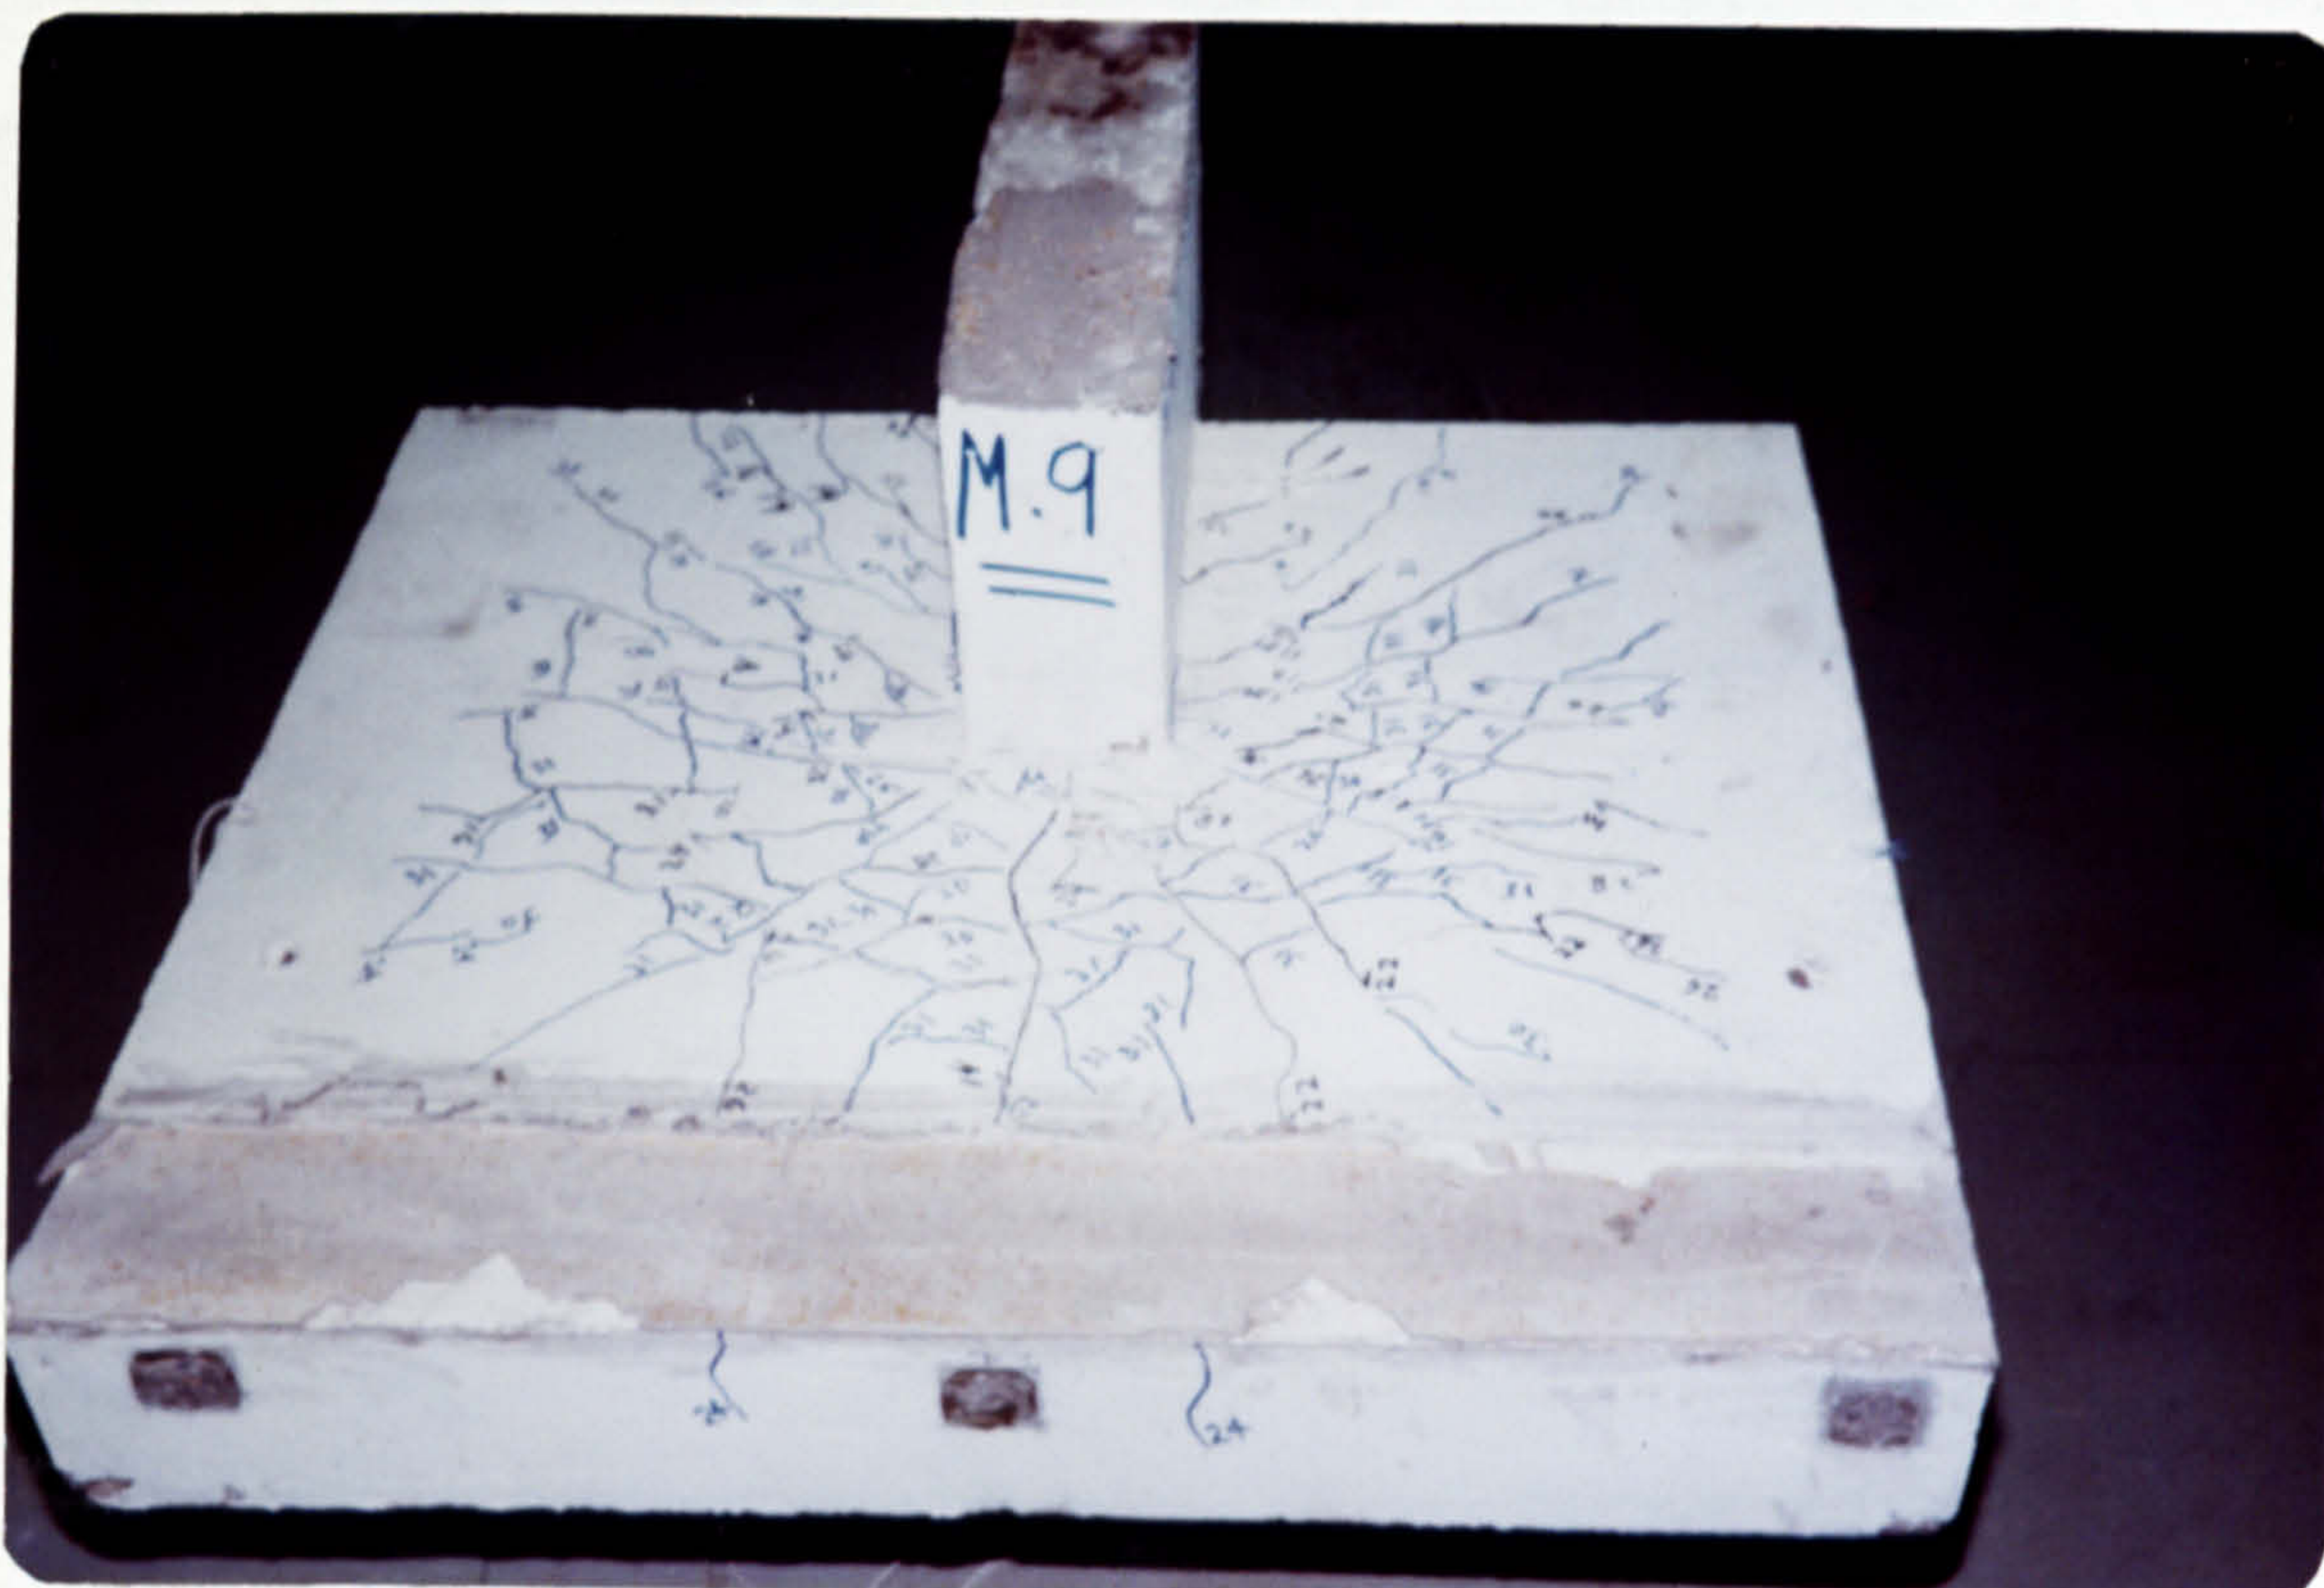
Crack pattern of the slab of model MT9 after failure.
